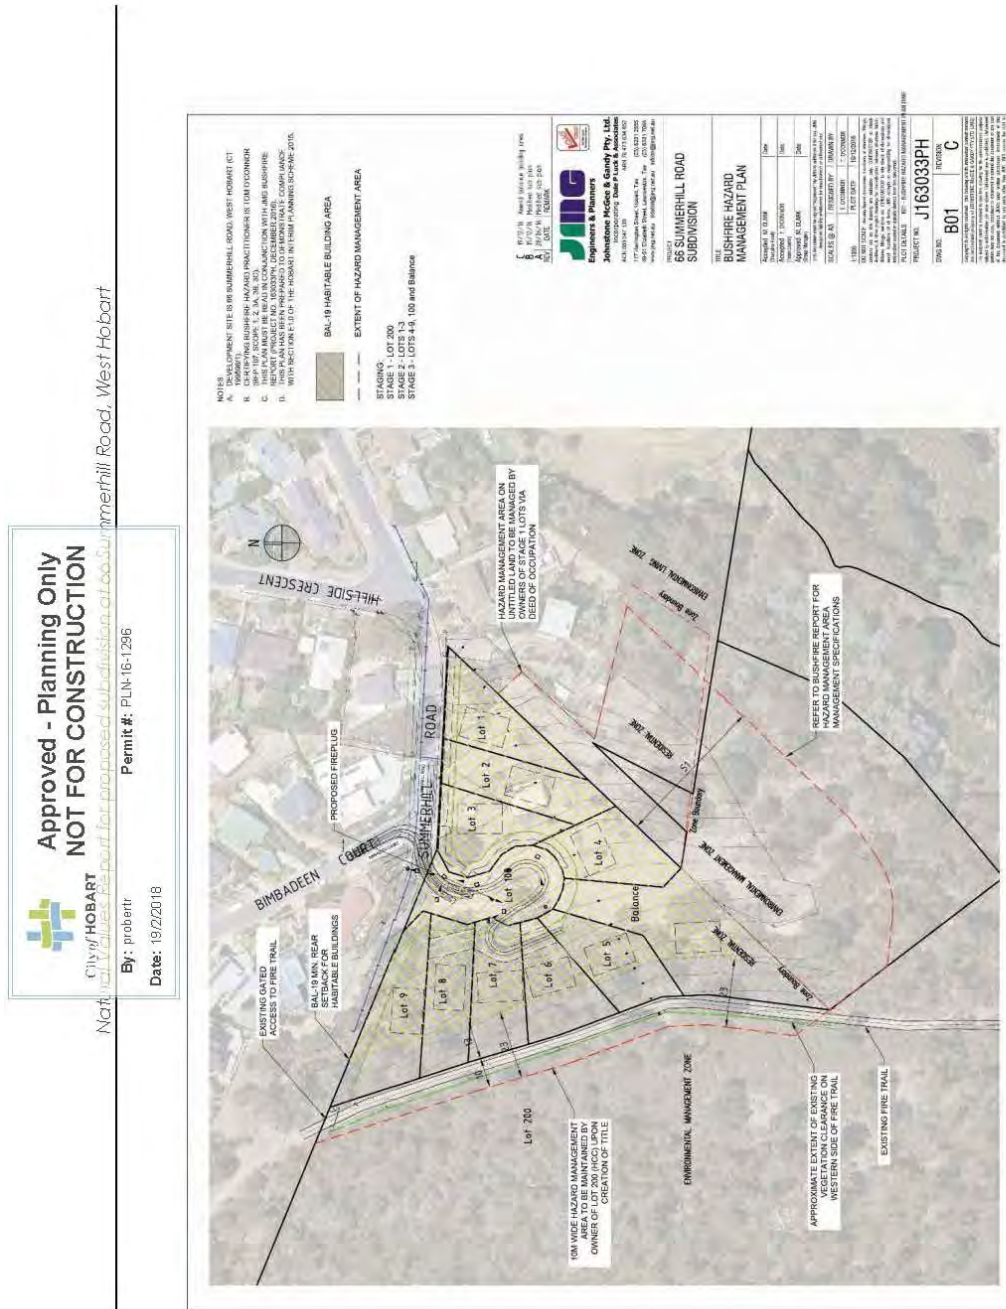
Bushfire Hazard Management Plan (Reproduced from Drawing B01 v3 - Project # J163033PH) JMG Engineers and Planners
